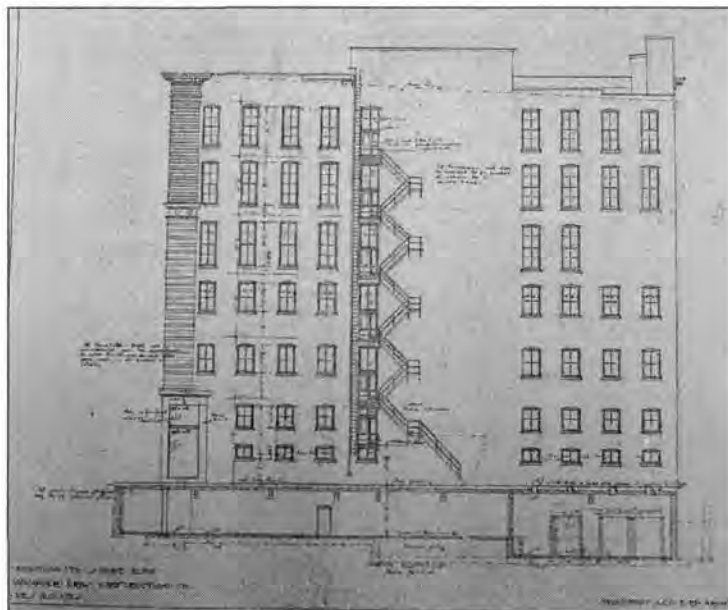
north elevation, east building (original plans, architects Proudfoot and Bird, Sheet 12, undated)
